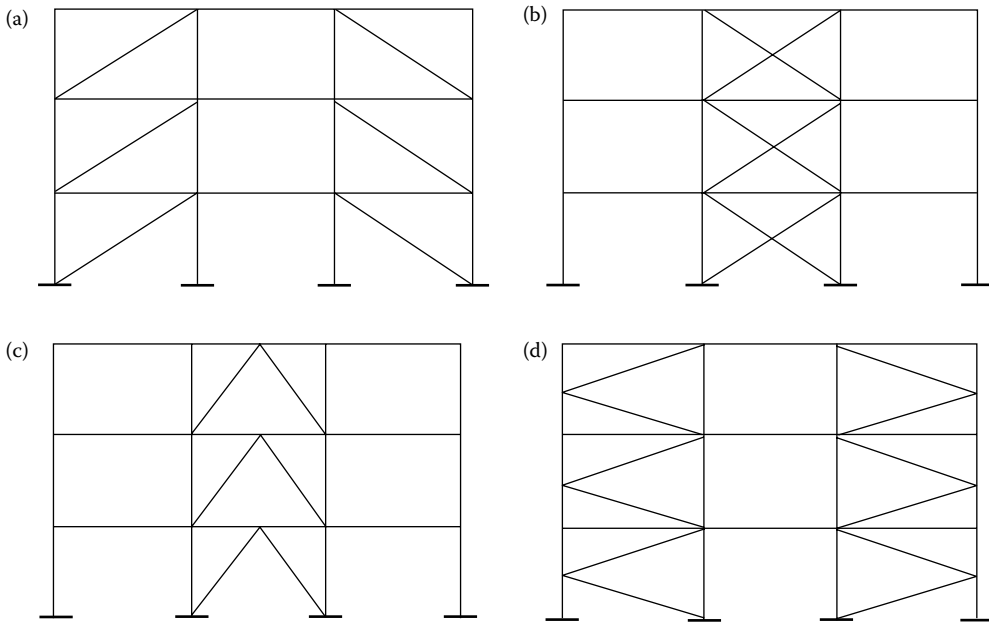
Typical idealised configurations of concentrically braced frames. (a) Non-intersecting braces, (b) cross-bracing, (c) V or inverted-V bracing and (d) K-bracing.
